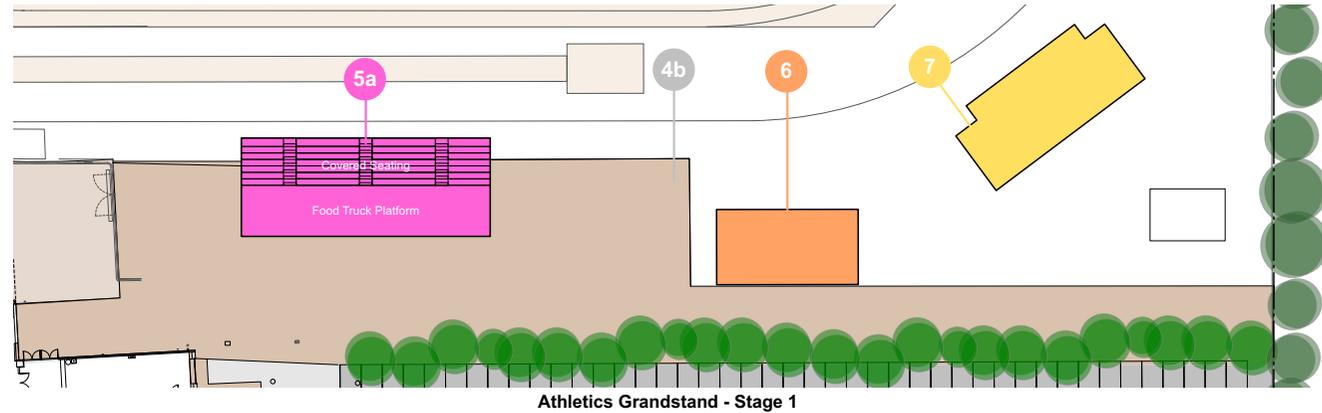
Facility Improvement Plan – Athletics Grandstand Design
